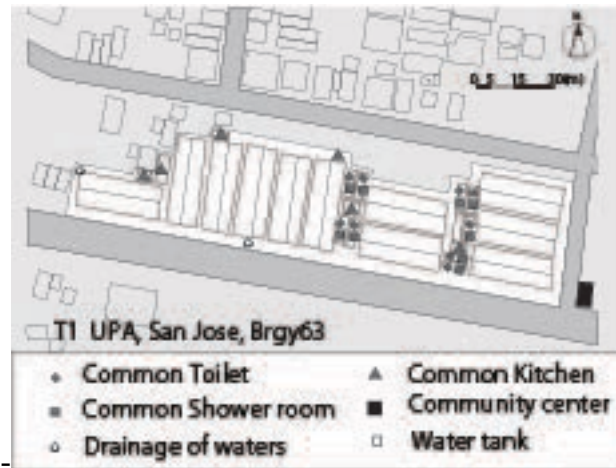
9: Site Development Plan of T1, UPA, San Jose, Brgy 63
